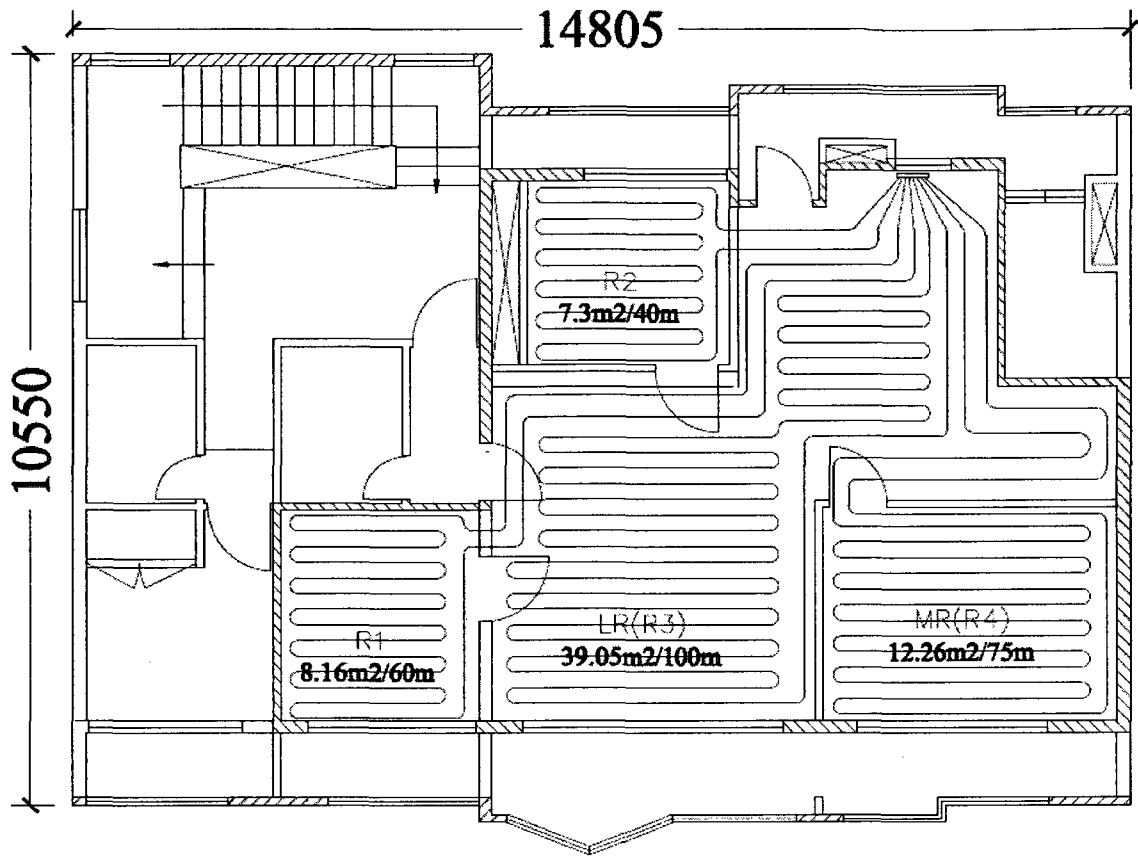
Plan view of the 4-zone apartment with RFH system
